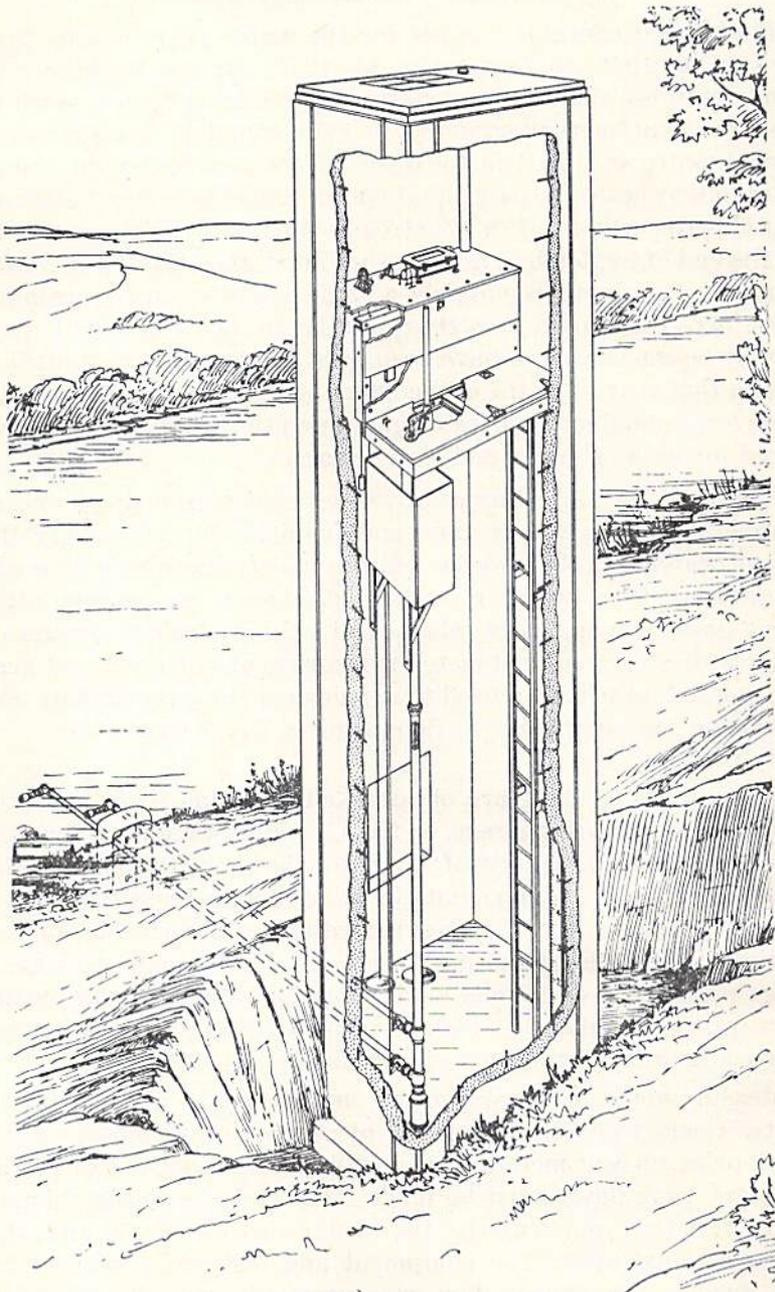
Typical design of river-measurement station showing reinforced concrete well and house for water-stage recorder.
